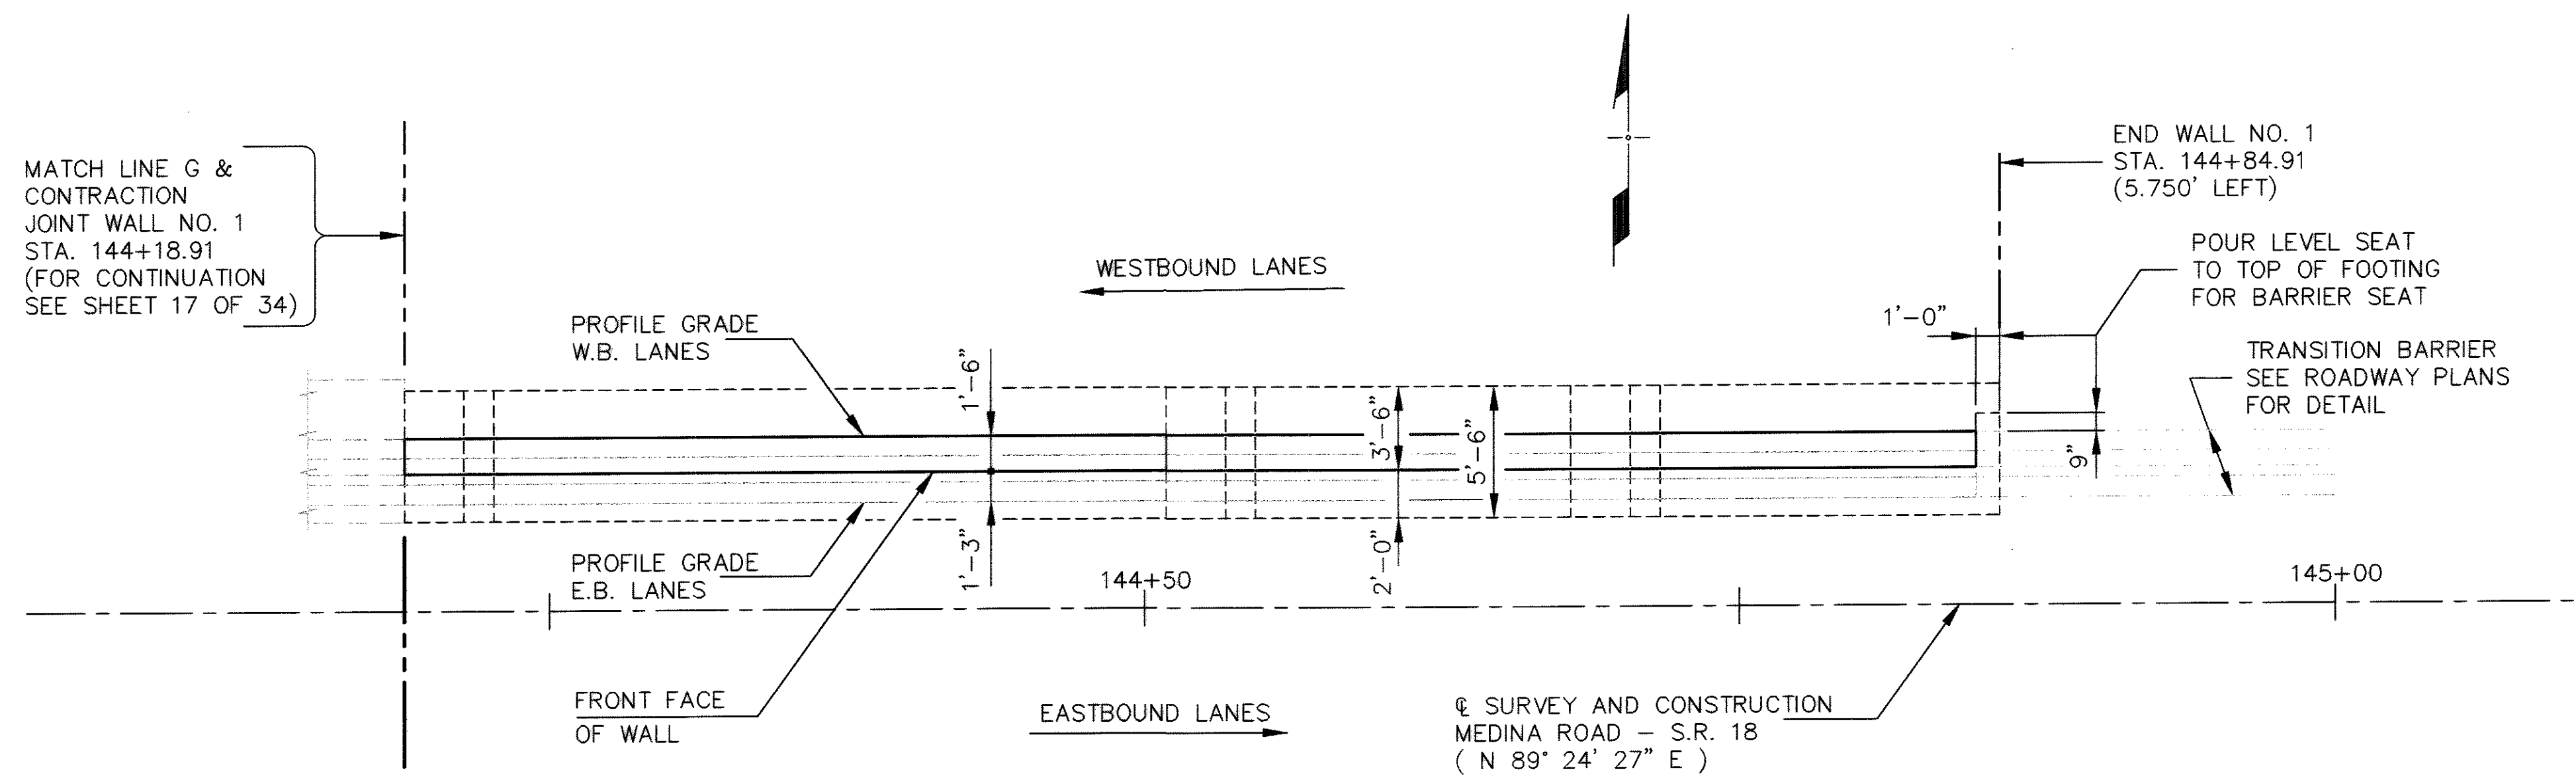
(PANELS W1-25 THRU W1-28)
